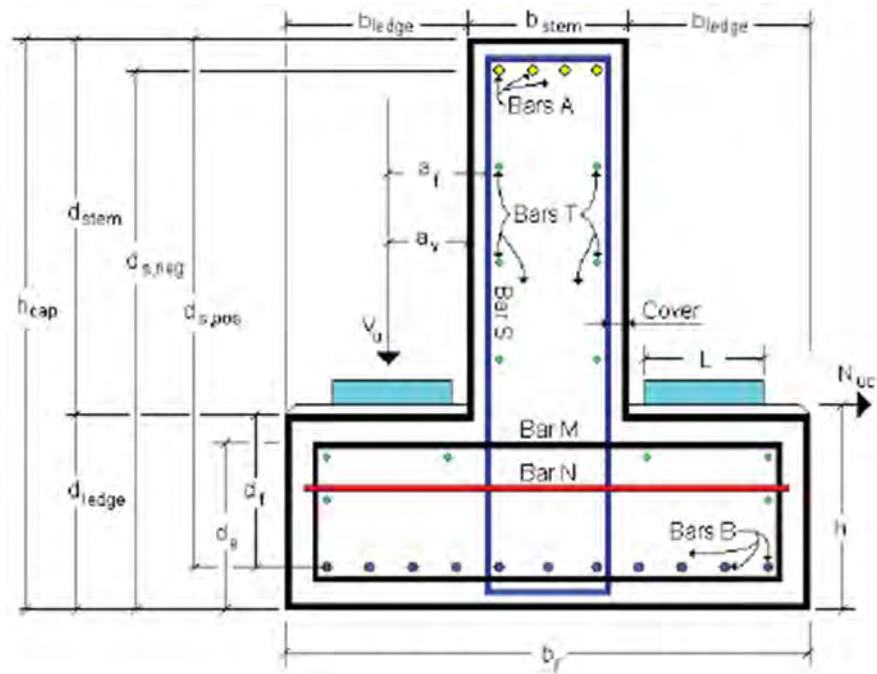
Section View of 60 Degrees Skewed ITBC
